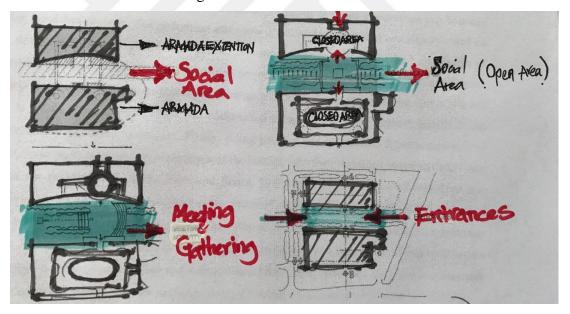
The expansion plan sketches of Armada Shopping Center (Personal drawing)
